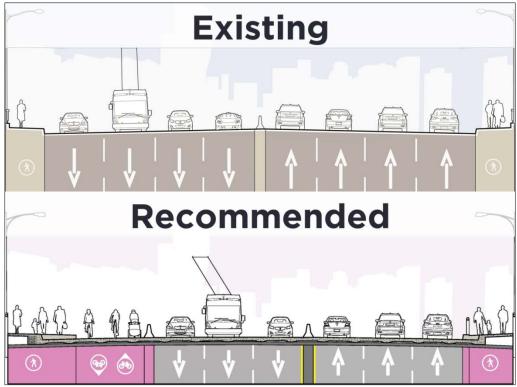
Cross-section of long-term recommended design (mid-section, looking north)
